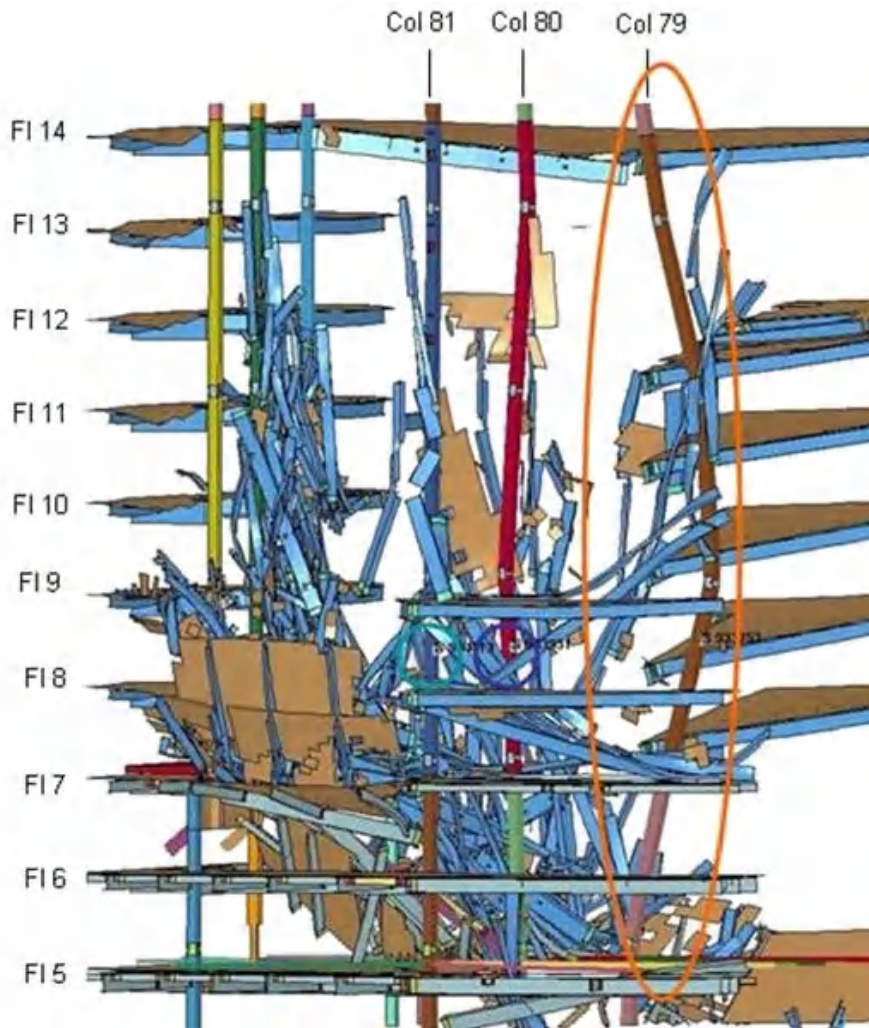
Column buckling (NIST Building and Fire Research Laboratory).
